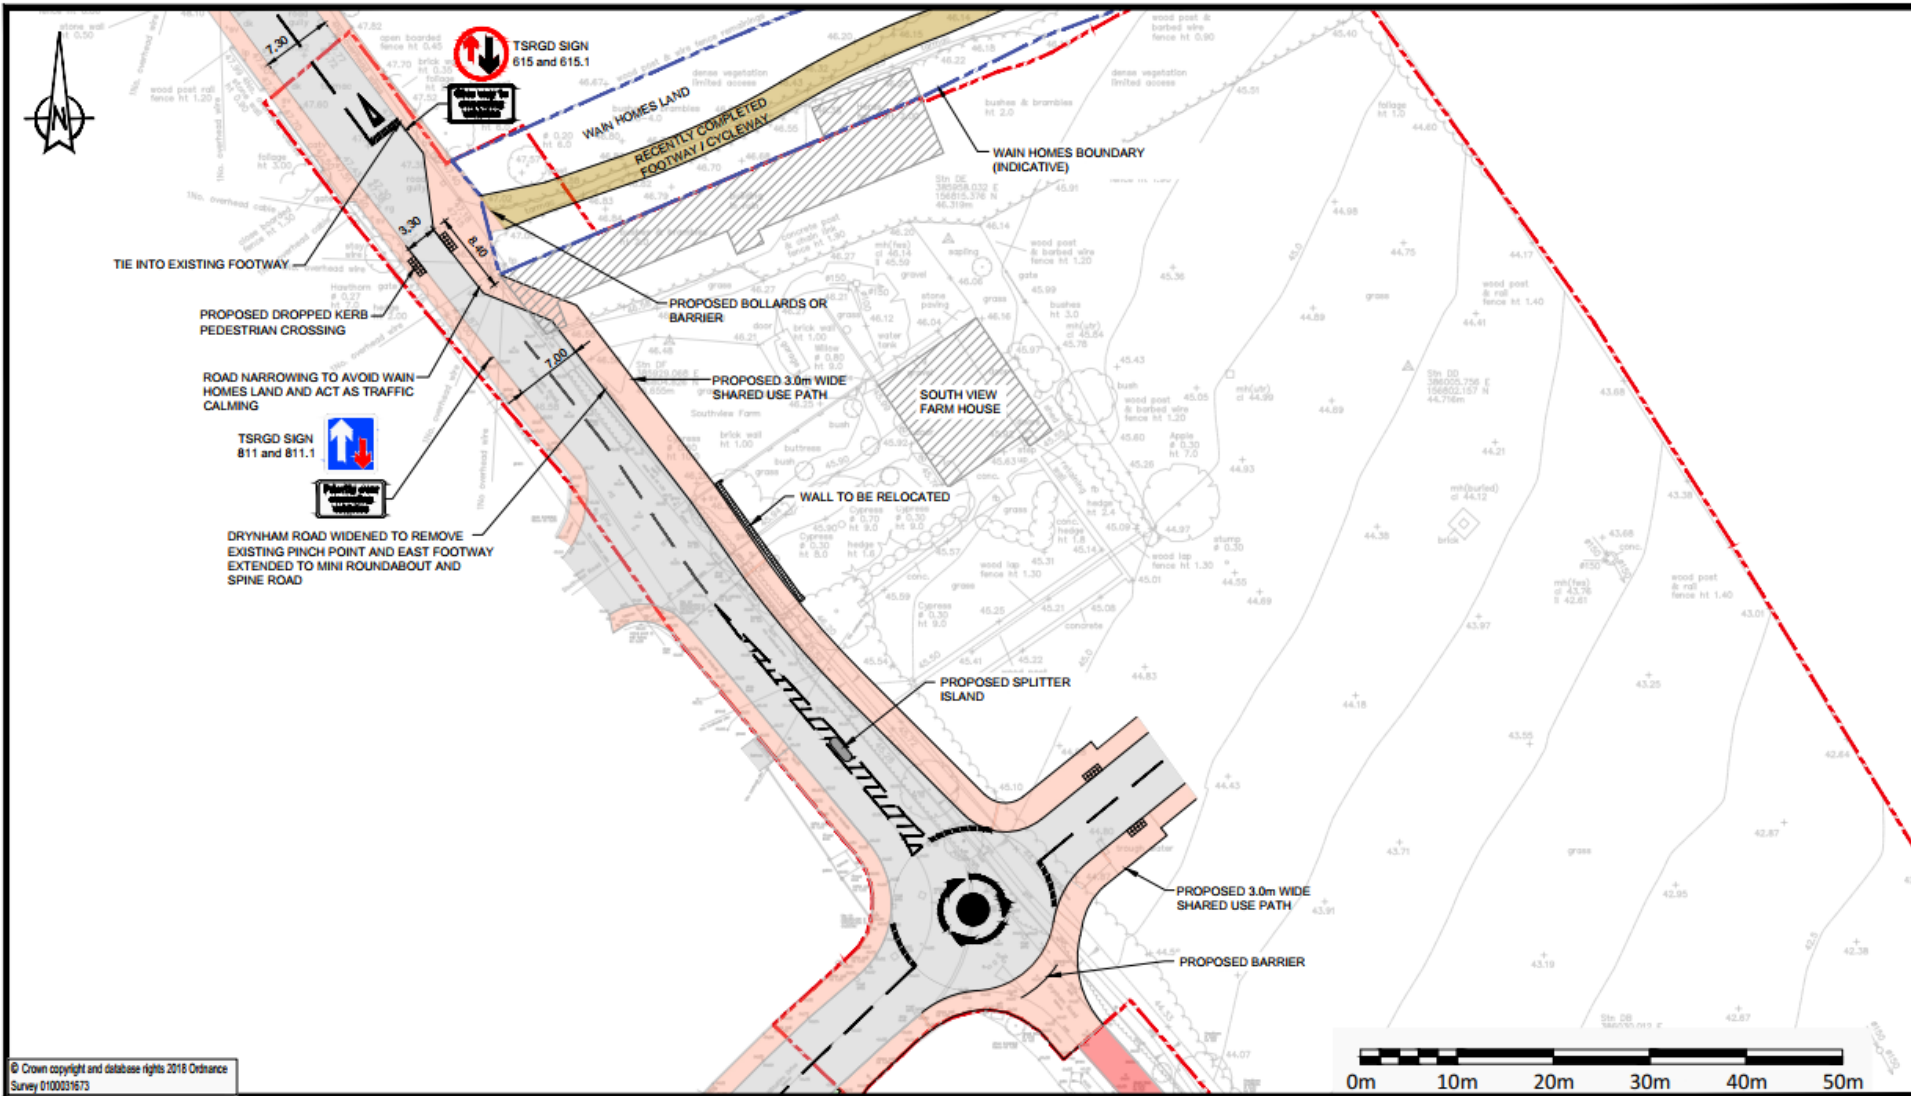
Proposed Site Plan Showing the Pedestrian/Cycle Routes
